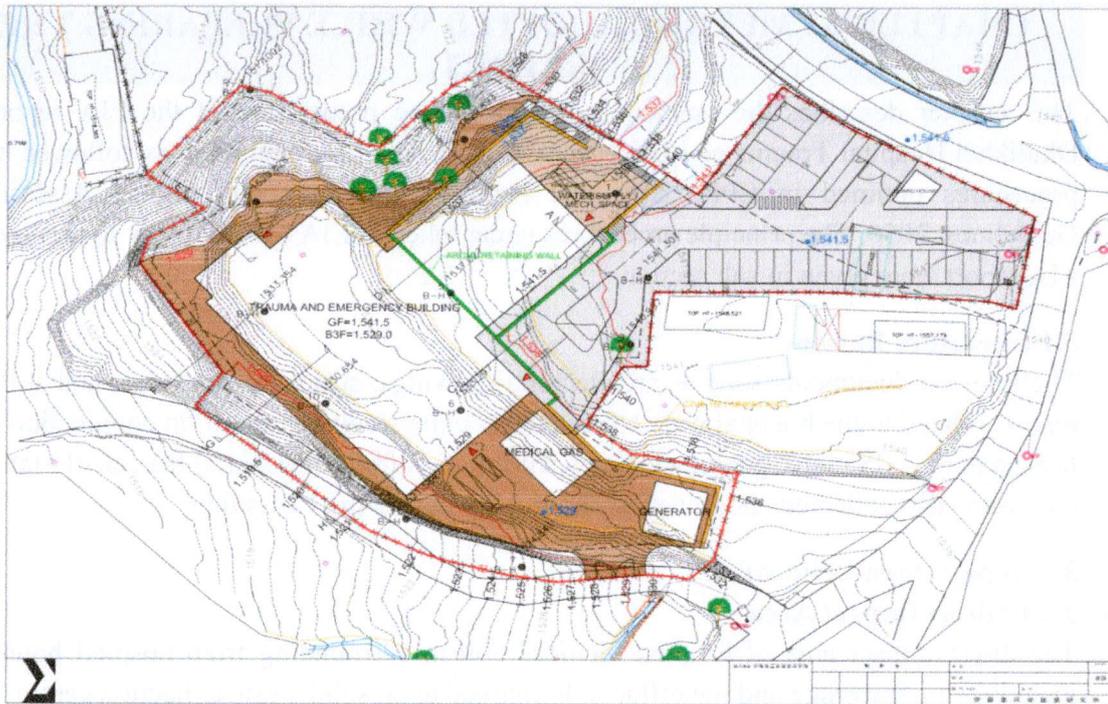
Layout plan for construction of Dhulikhel Hospital Trauma and Emergency center
